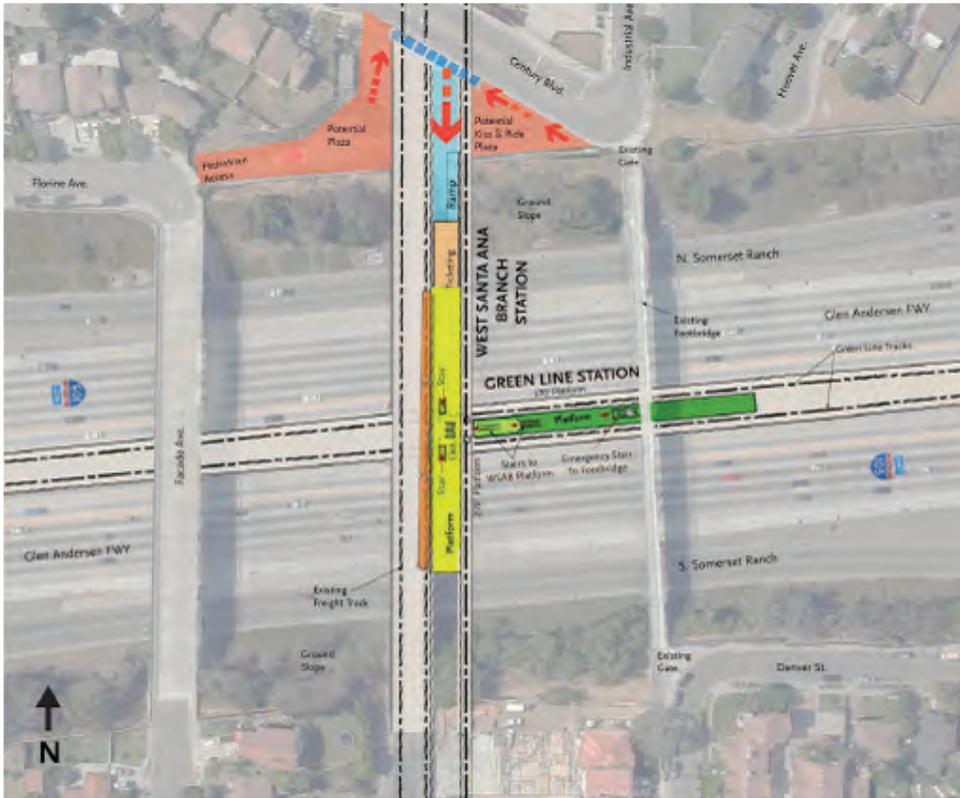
Center platform plan of WSAB/Green Line Station (yellow), and center platform new Metro Green Line Station (green) in middle of I-105 Freeway
